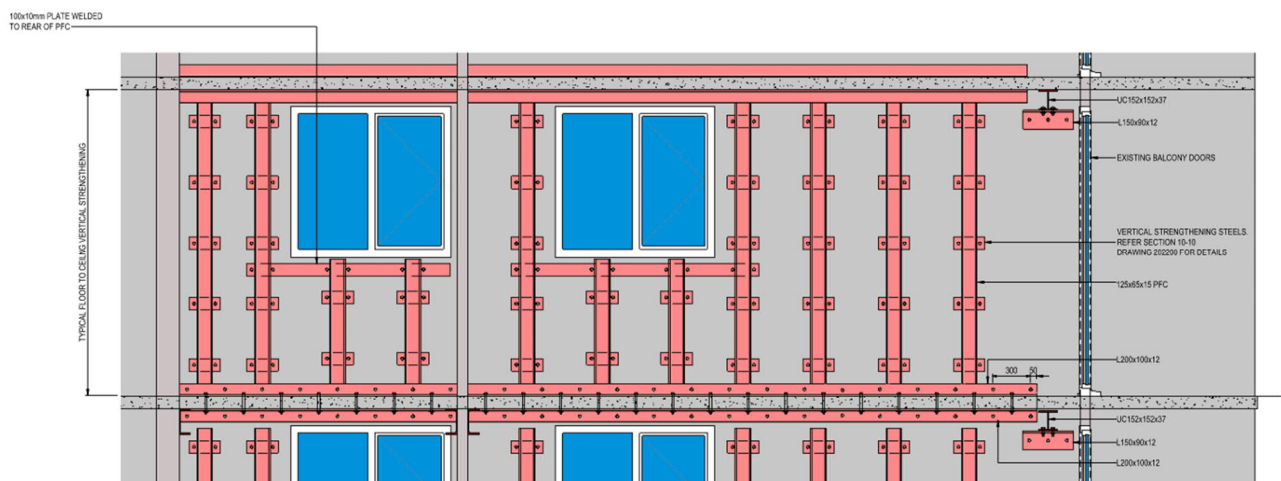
Typical flank and cross wall strengthening detail – Bird Block, Nettleton & Dudney
